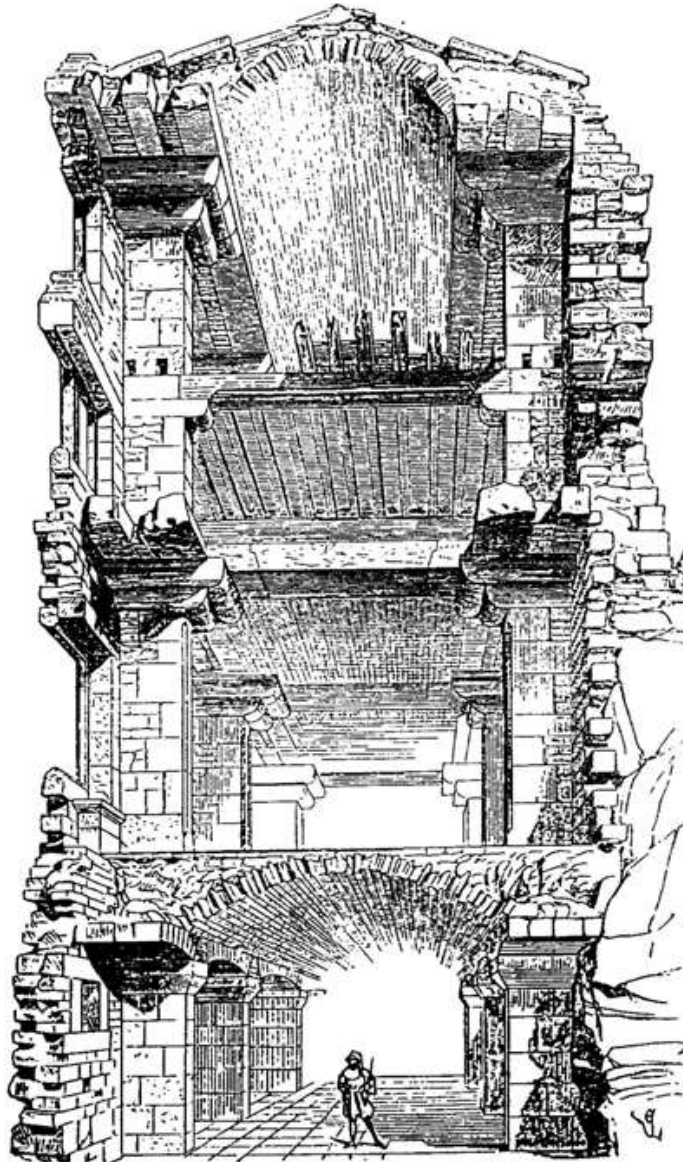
Constructive section through a medieval building. Details of the construction of roman and medieval walls (Viollet-le-Duc 1858)
